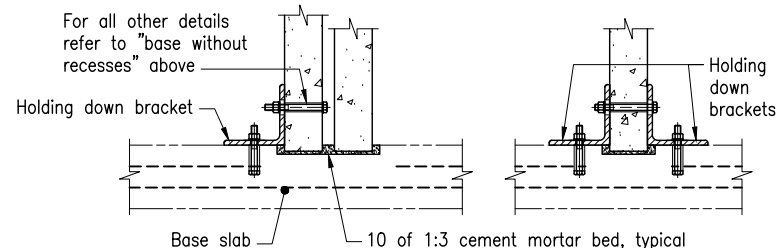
HEADWALL FOR R C BOX CULVERTS
